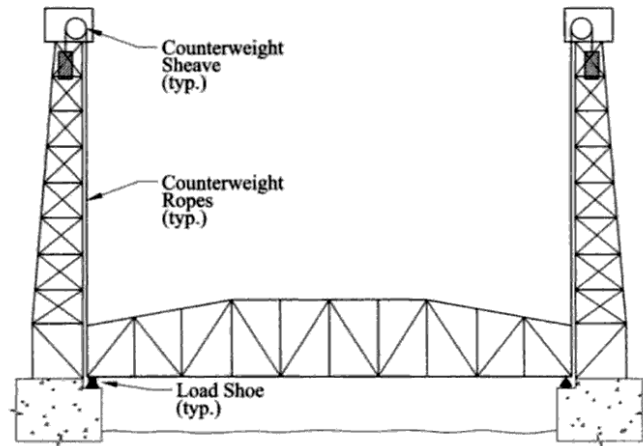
Typical vertical lift bridge layout (Koglin, 2003)
